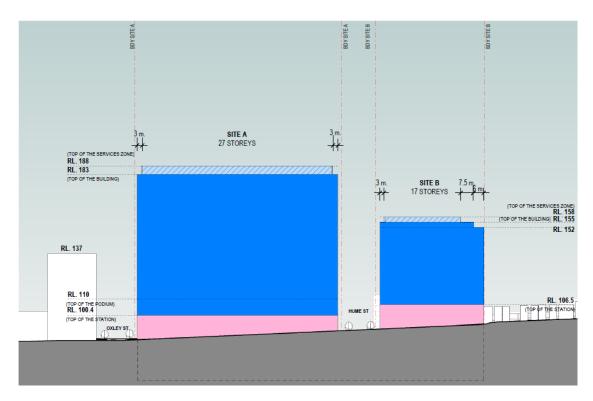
A: Proposed Crows Nest OSD building envelopes – west elevation (Pacific Highway)
